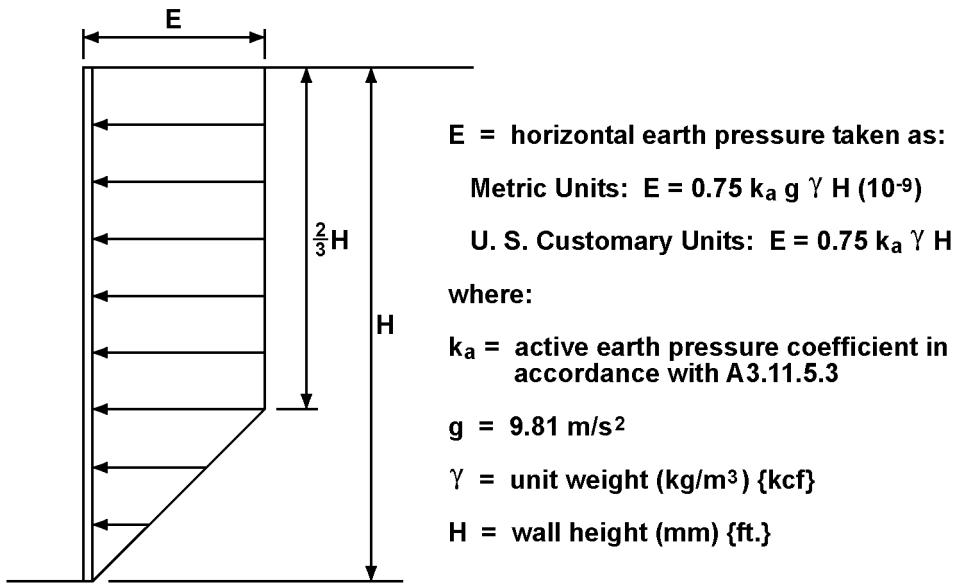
Apparent Earth Pressure Distribution for Soil Nail
